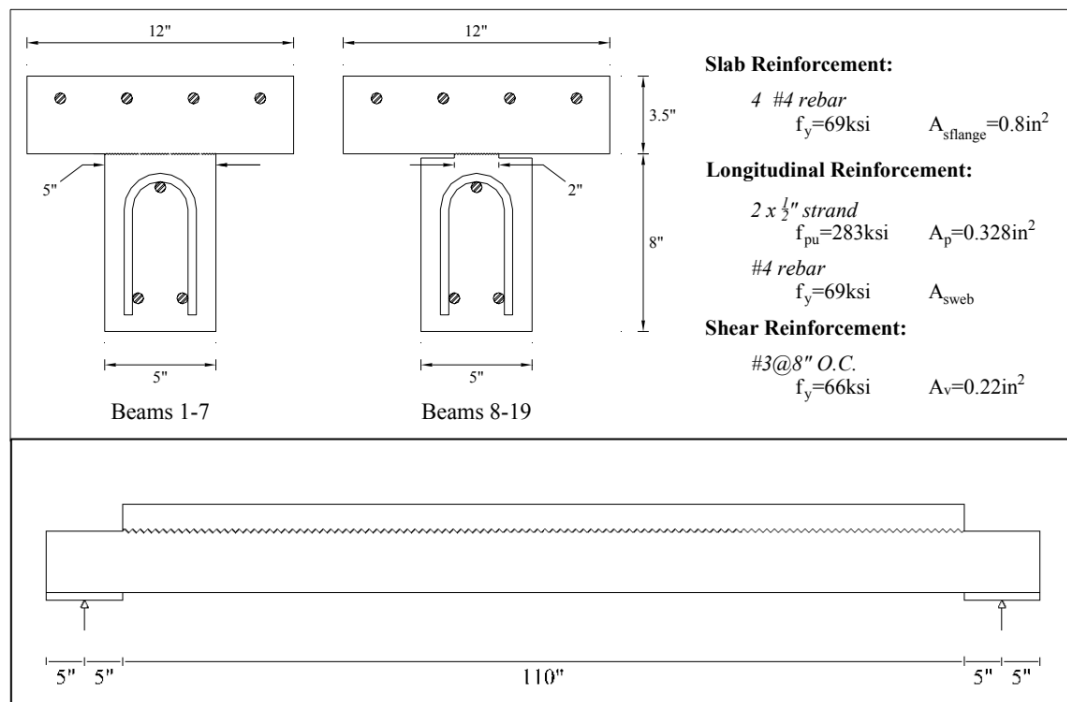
Cross-section and elevation of T-beam specimens in Phase 1 tested by Kovach and Naito (2008).
